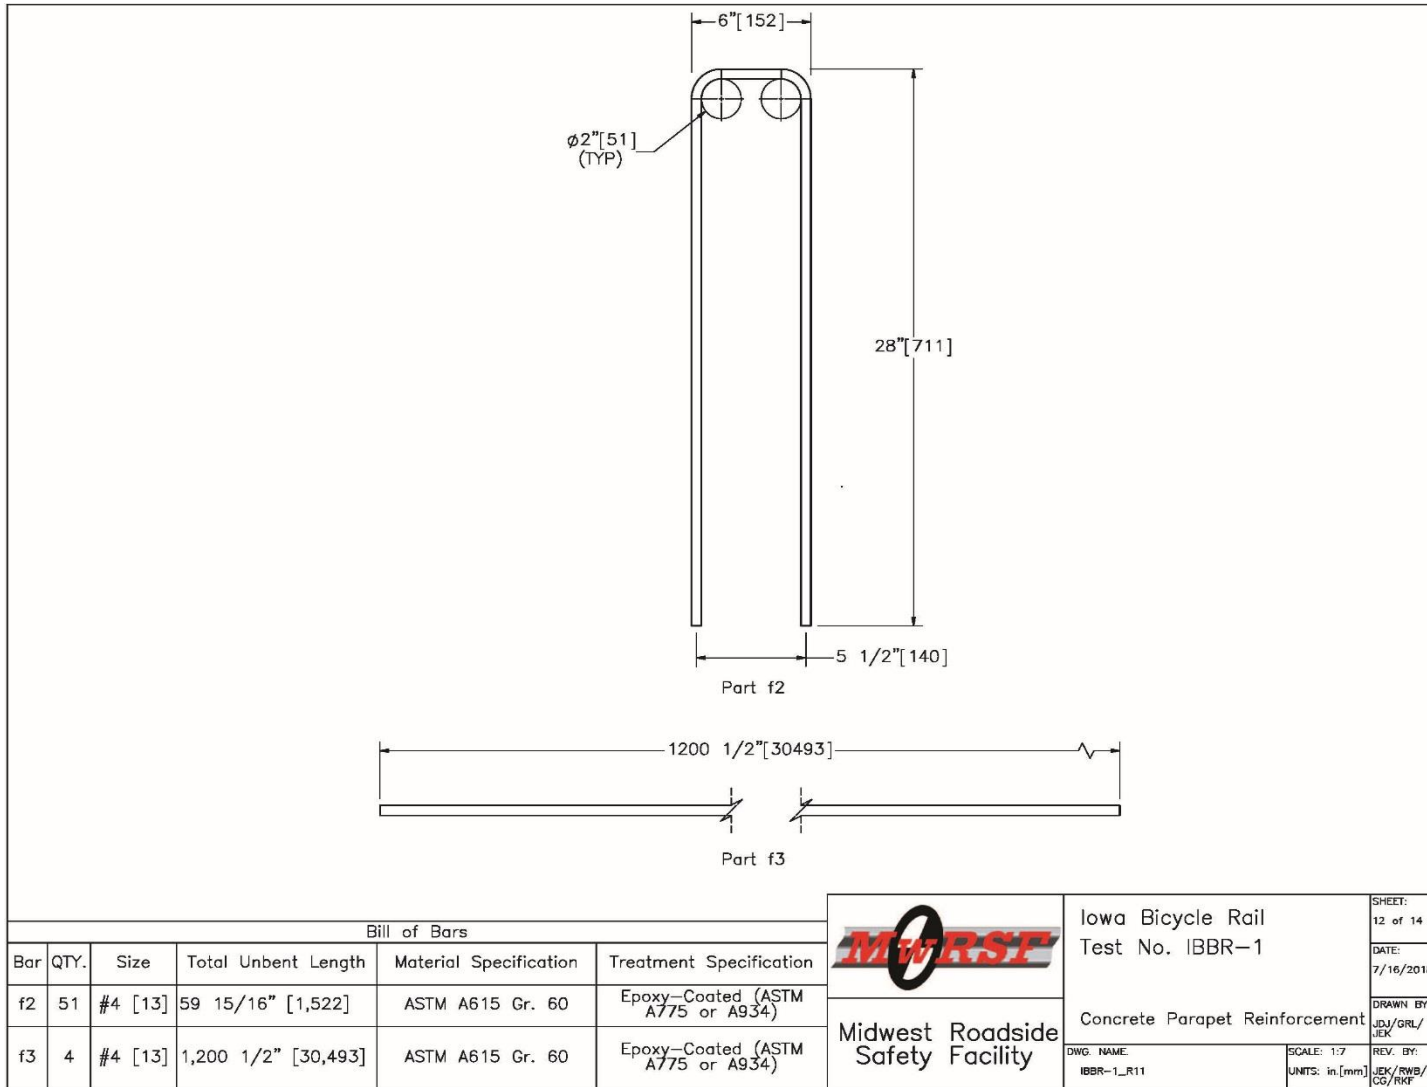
Iowa Bicycle Rail – Concrete Parapet Reinforcement
